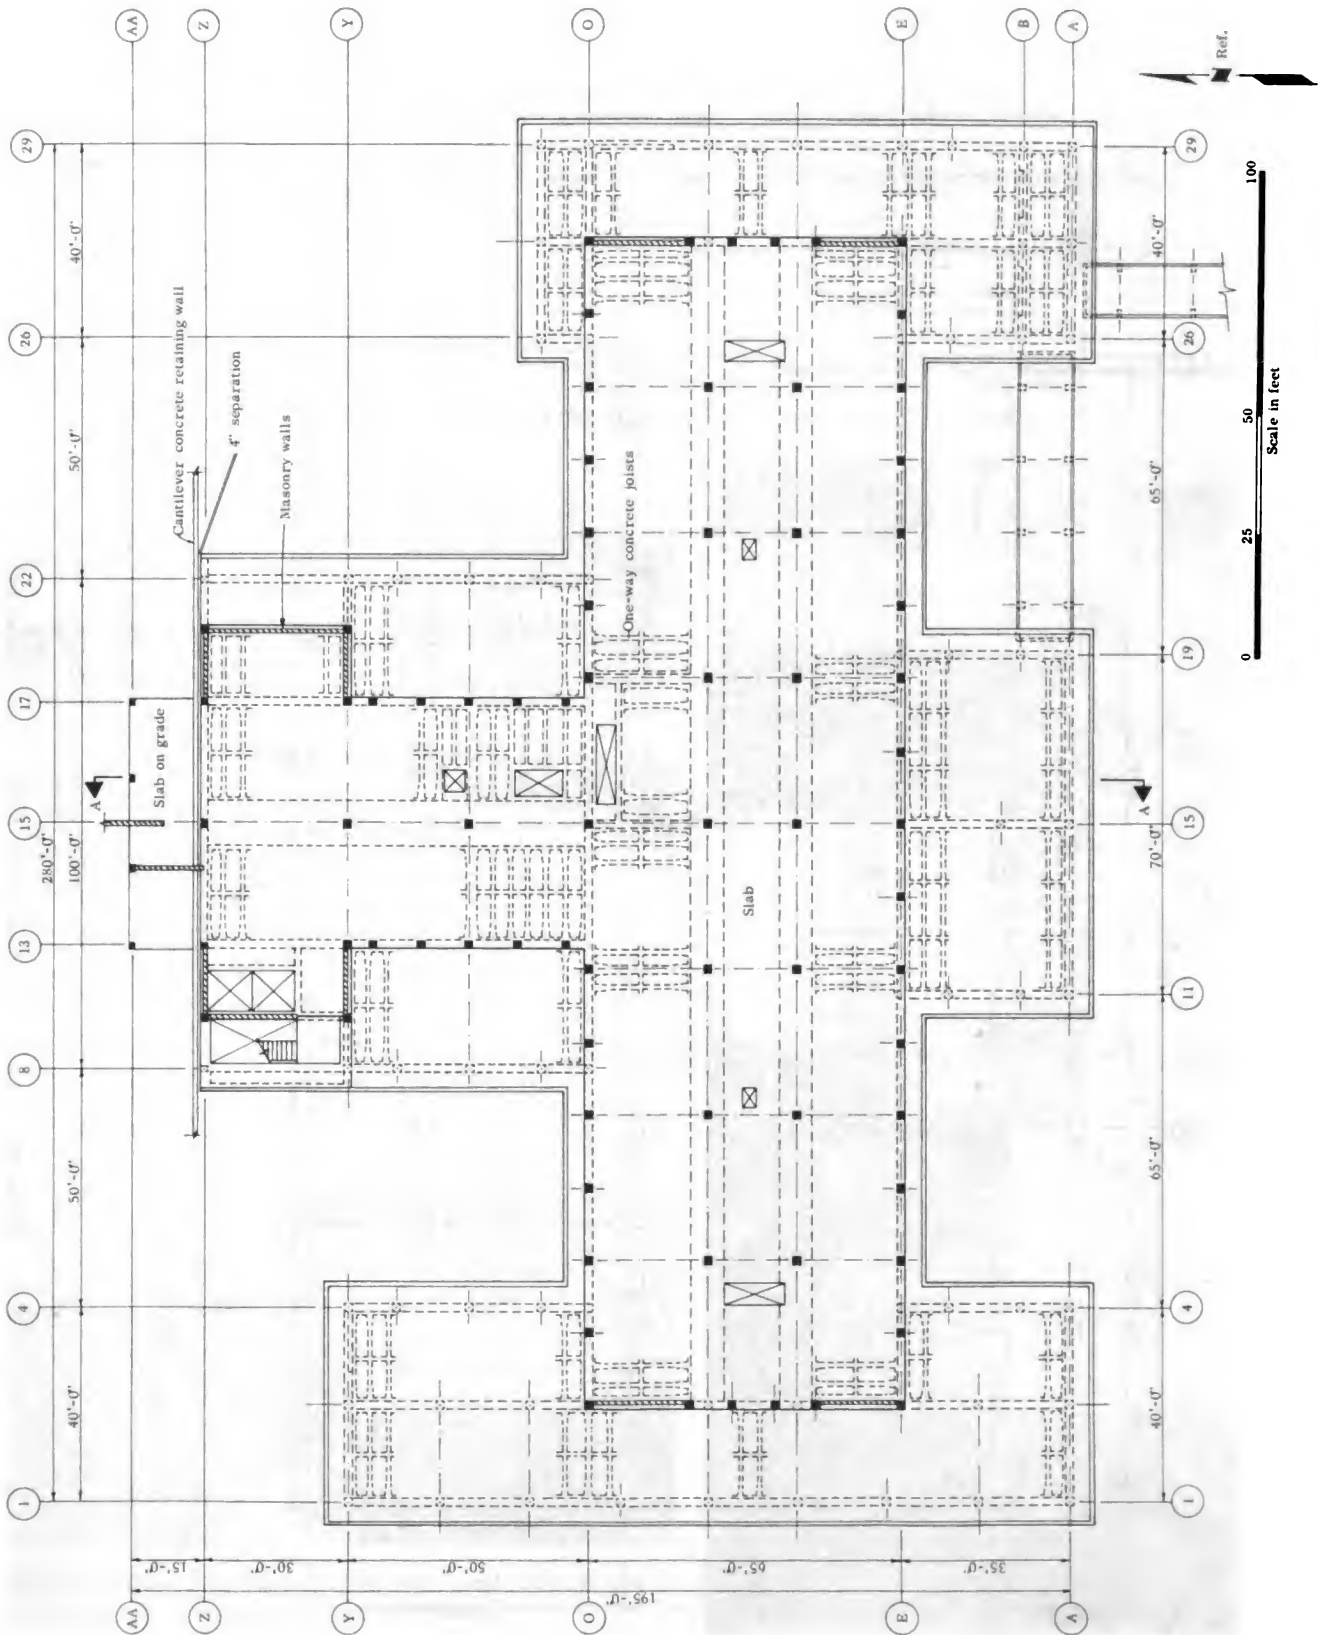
Olive View Hospital, psychiatric unit. First-floor and foundation plan.
